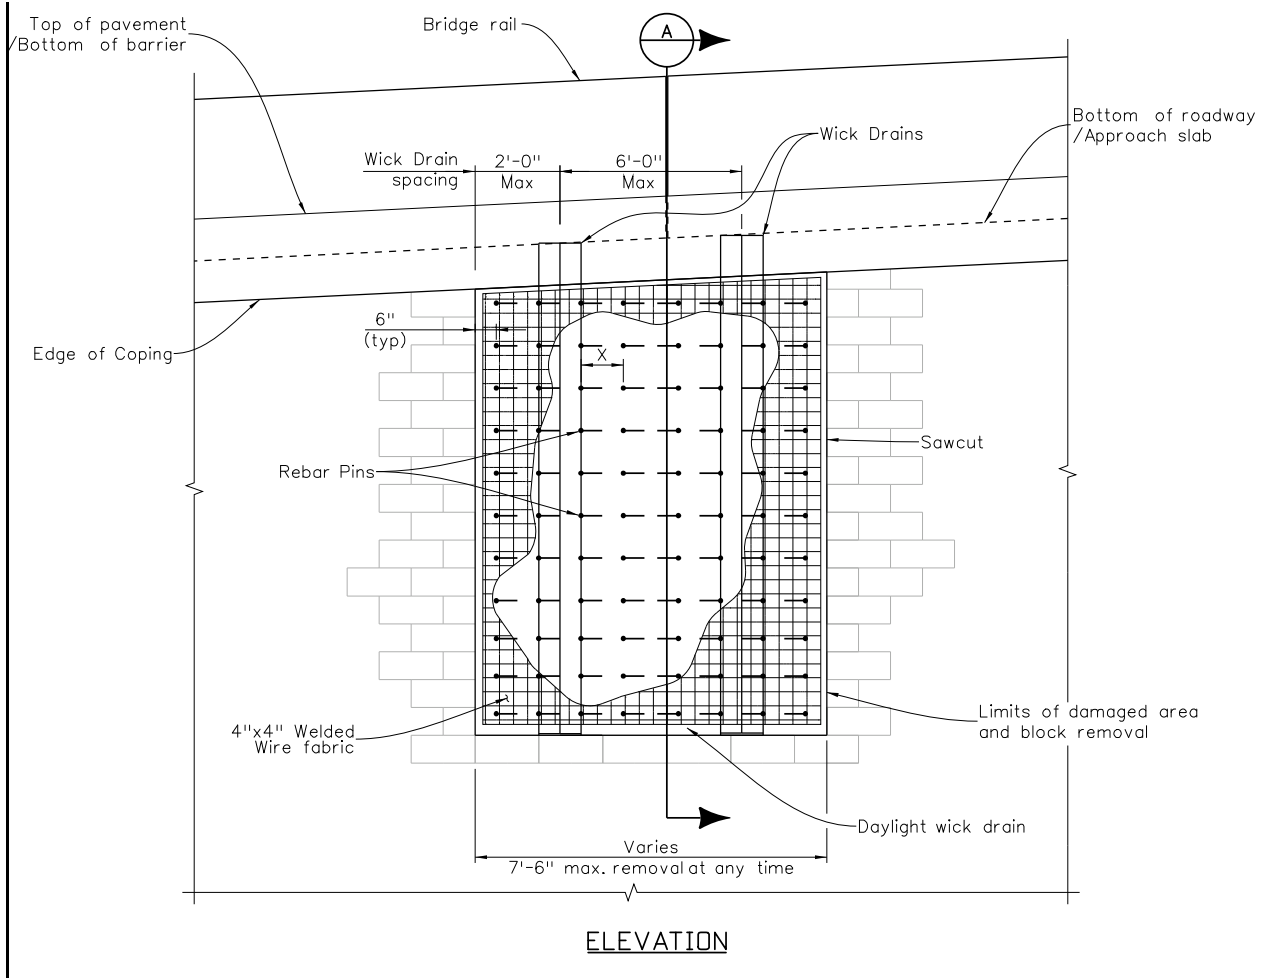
(J)-1 Sample Elevation of Area to be repaired on a MSE Wall
